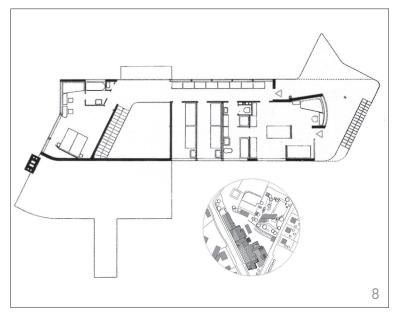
First floor plan of *Haus Schminke* during the warm season, with indication of exterior doors and curtains drawn back. Redrawn by Jan Fallgatter Hochschule Zittau/Görlitz. Original plan printed with kind permission by Löbau city authorities.
